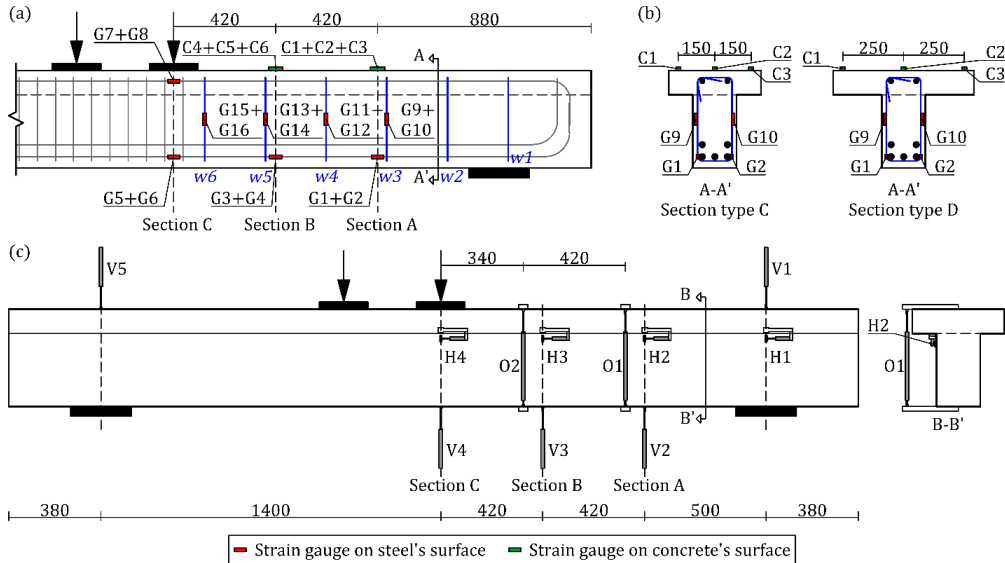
Instrumentation of the test specimens: (a) strain gauges at the principal span; (b) strain gauges at section A-A' for beams type C and D; (c) LVDTs (dimensions in mm).
